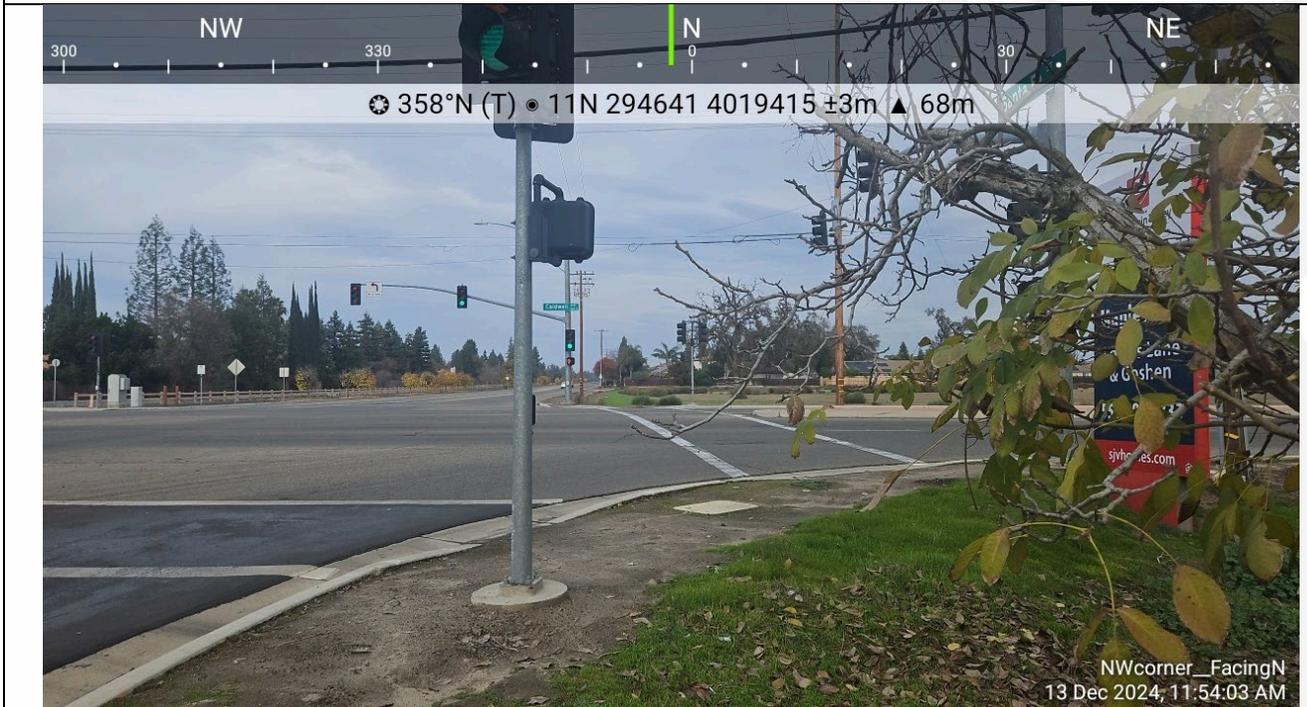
View of site conditions on the northwest corner of the project area facing north.
